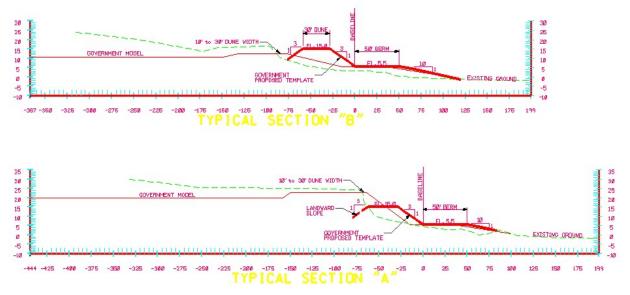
Selected Plan Typical Cross Sections to be Constructed
